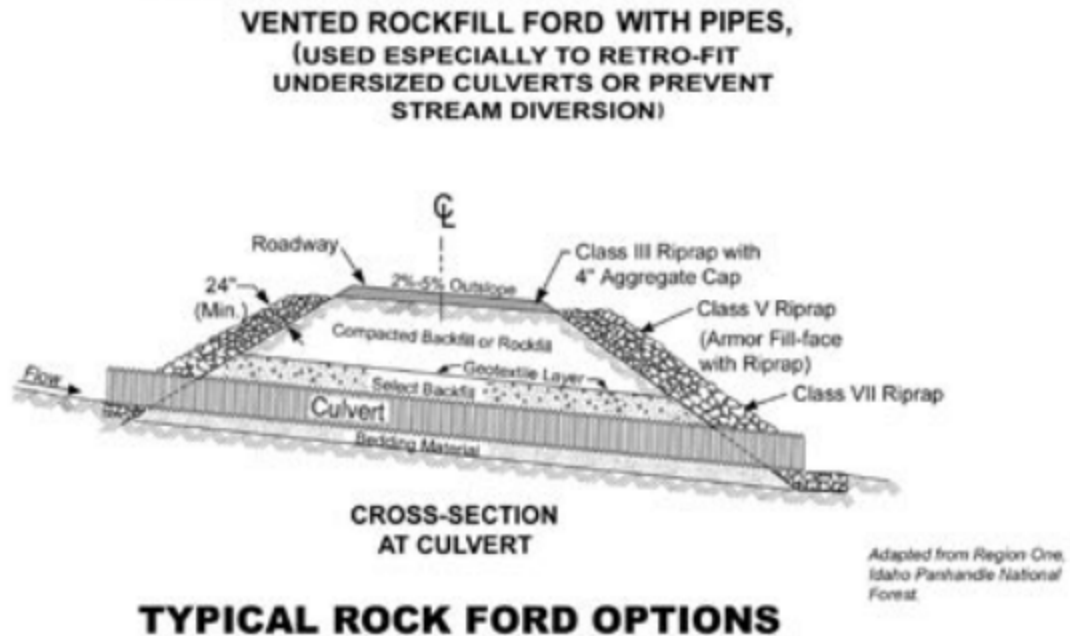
Sketch of design example of rockfill ford complimenting an existing culvert (U.S. Forest Service 2006)
